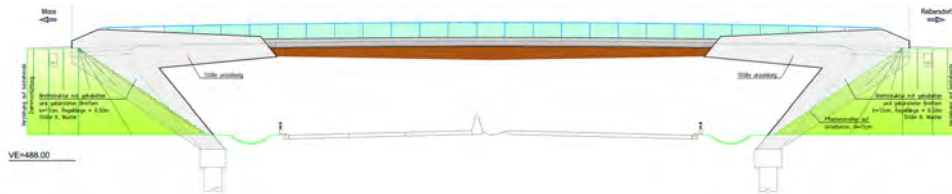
Existing Overpass bridge on the A1 Autobahn in Austria [1]
